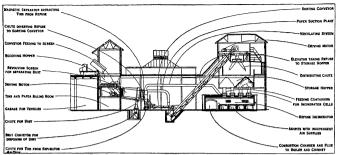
CROSS SECTION THROUGH MEENAN DESTRUCTOR SYSTEM
